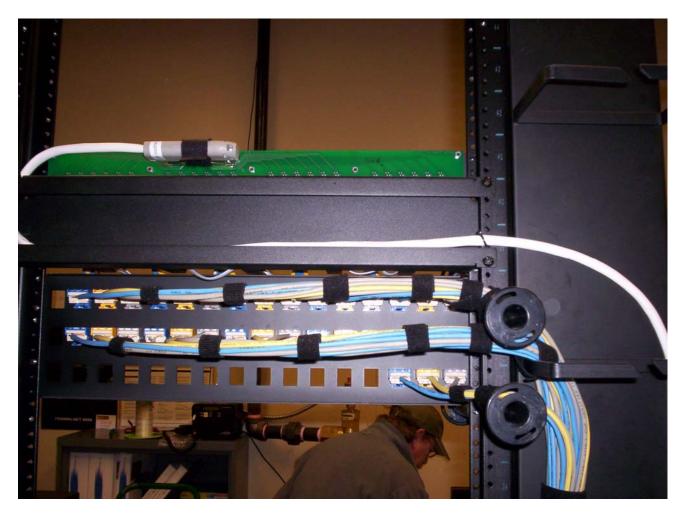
Example of Properly-Installed MDF Patch Panel Assembly
